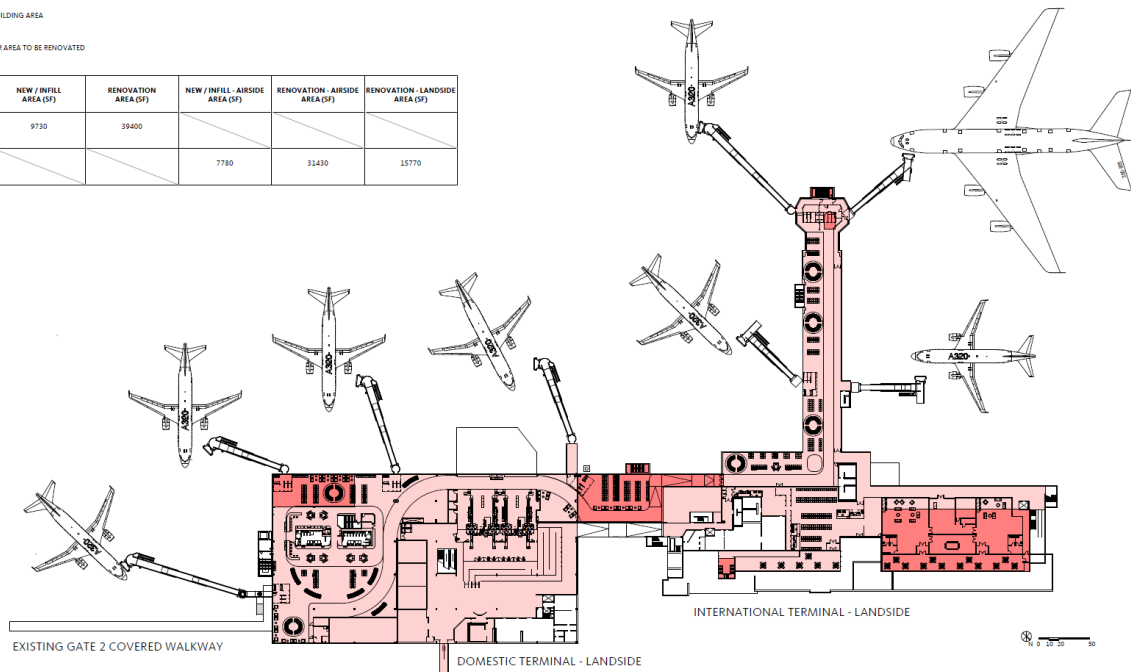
Diagram of Proposed Infill and Renovation Spaces
